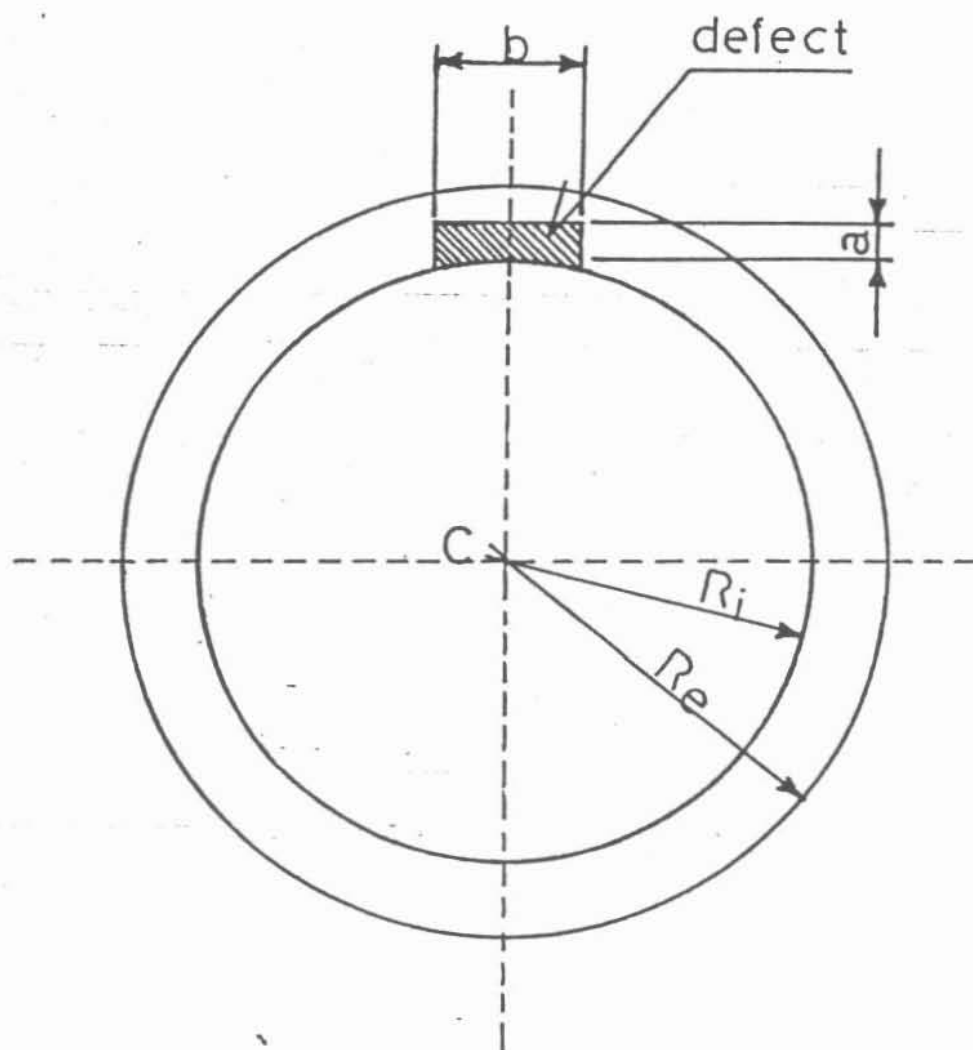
GEOMETRY OF A HOLLOW CIRCULAR CROSS SECTION WITH A SINGLE FRETTING CORROSION DEFECT
